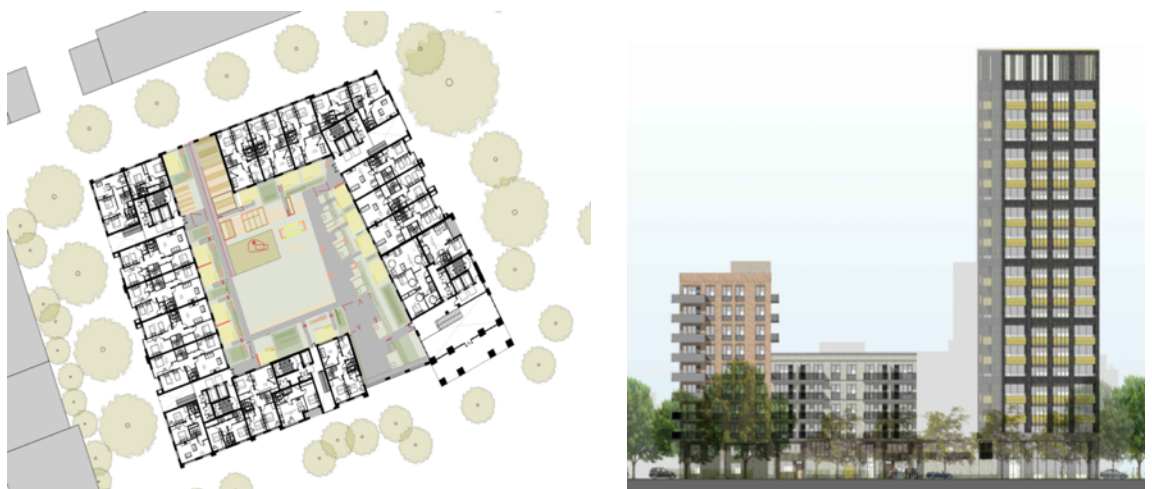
Approved first floor plan of subplot 4 and street elevation from Albany Road
